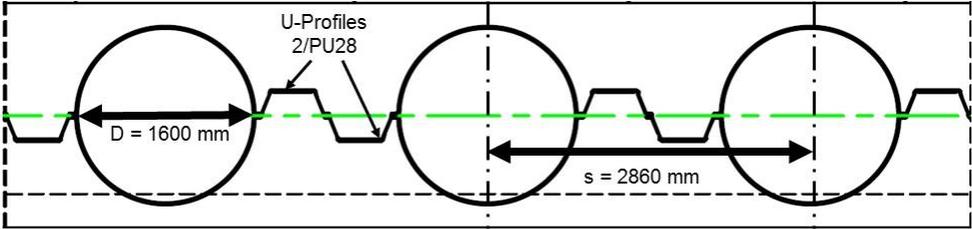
Scheme of wall section (only for the “Quay Wall”)
